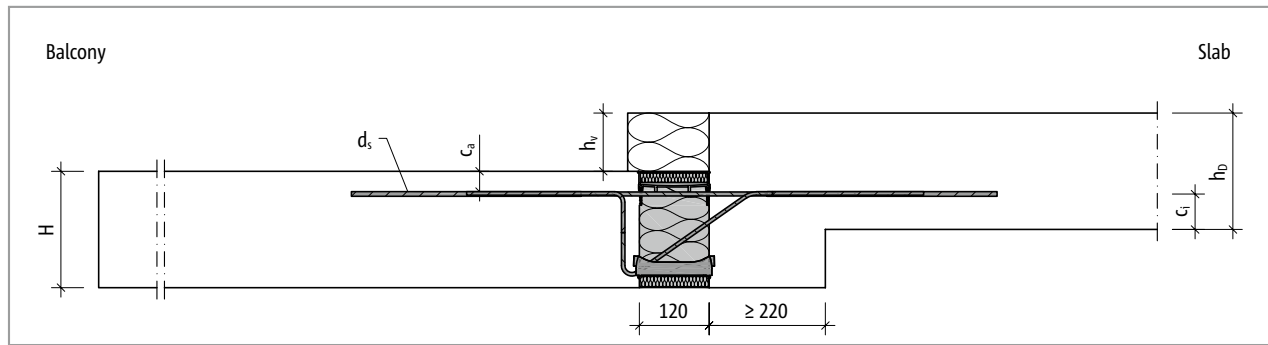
Schöck Isokorb® XT type K: Small height offset downwards (balcony subjacent)
